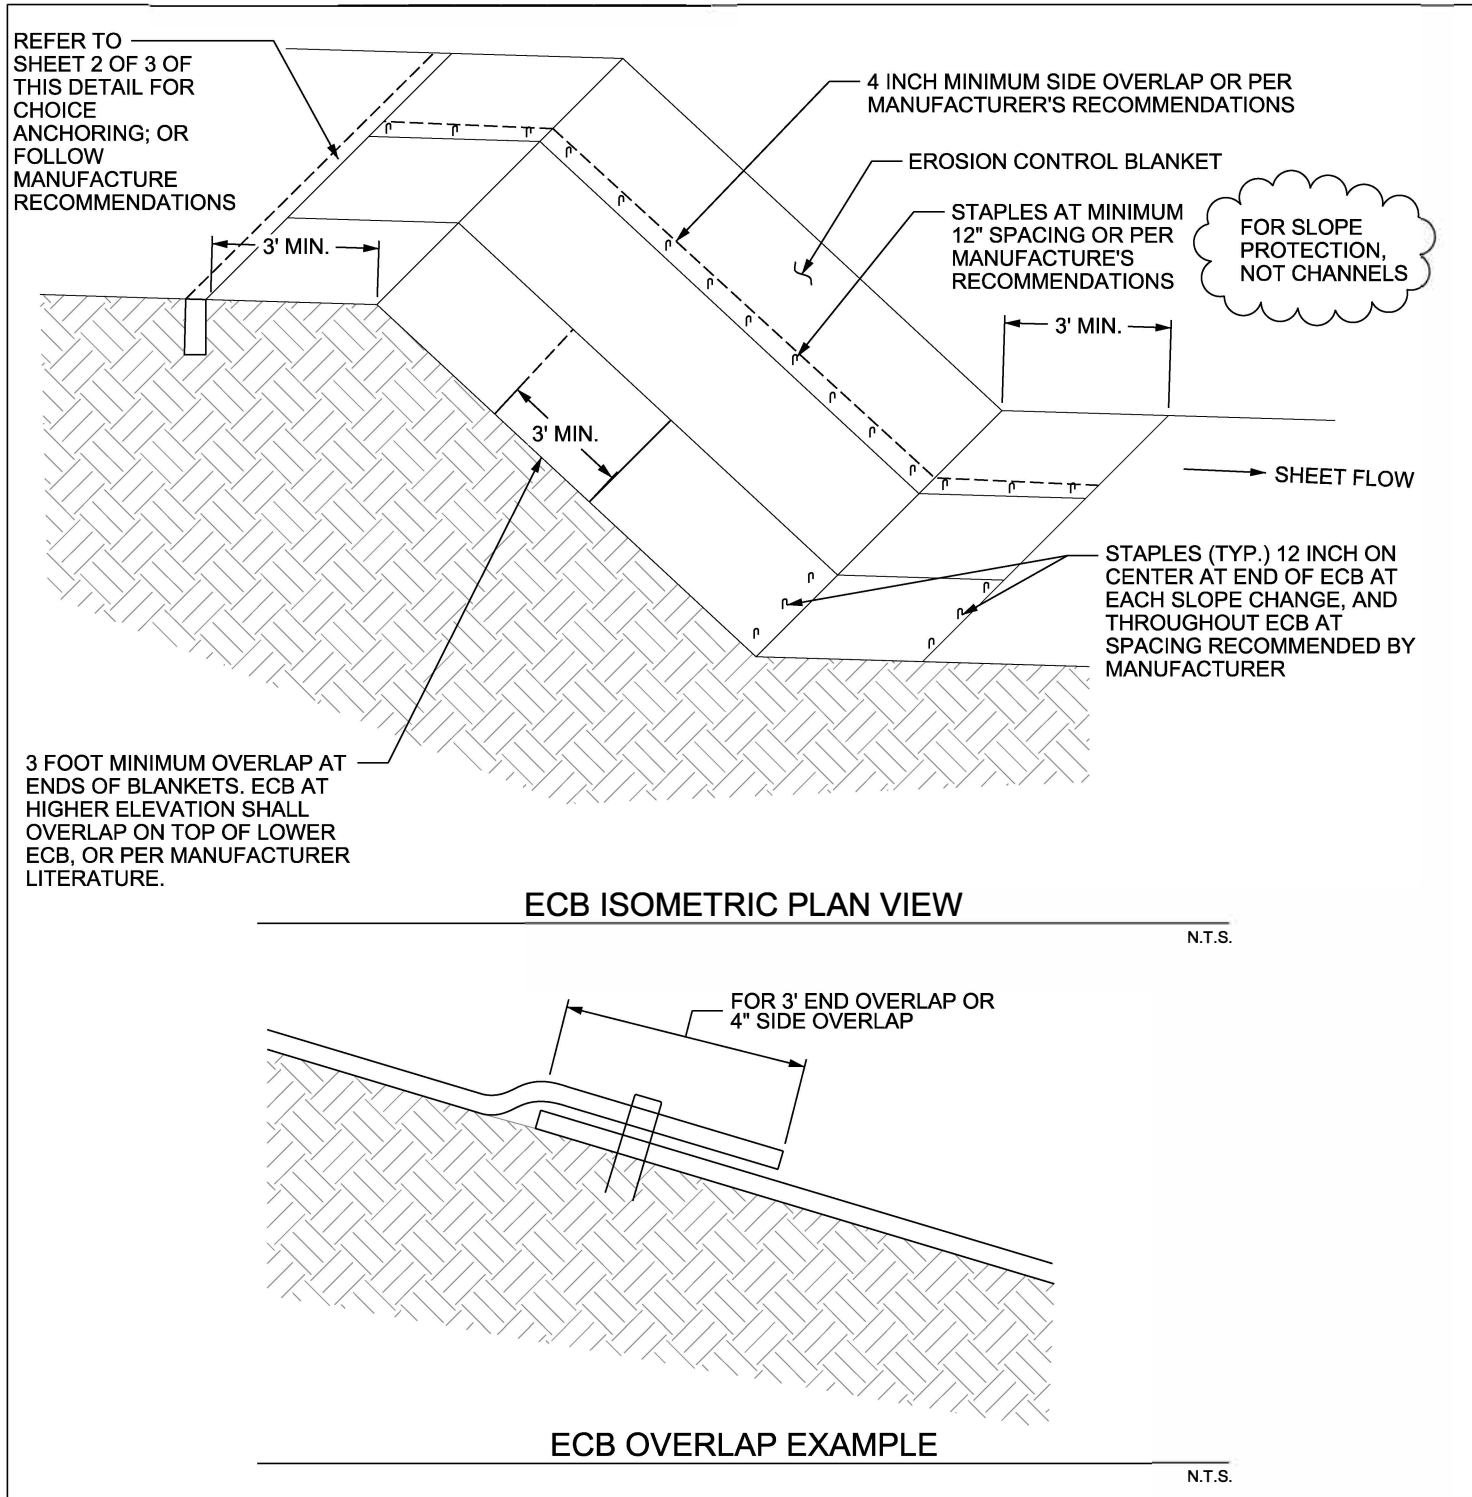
STANDARD CONSTRUCTION DETAIL -
